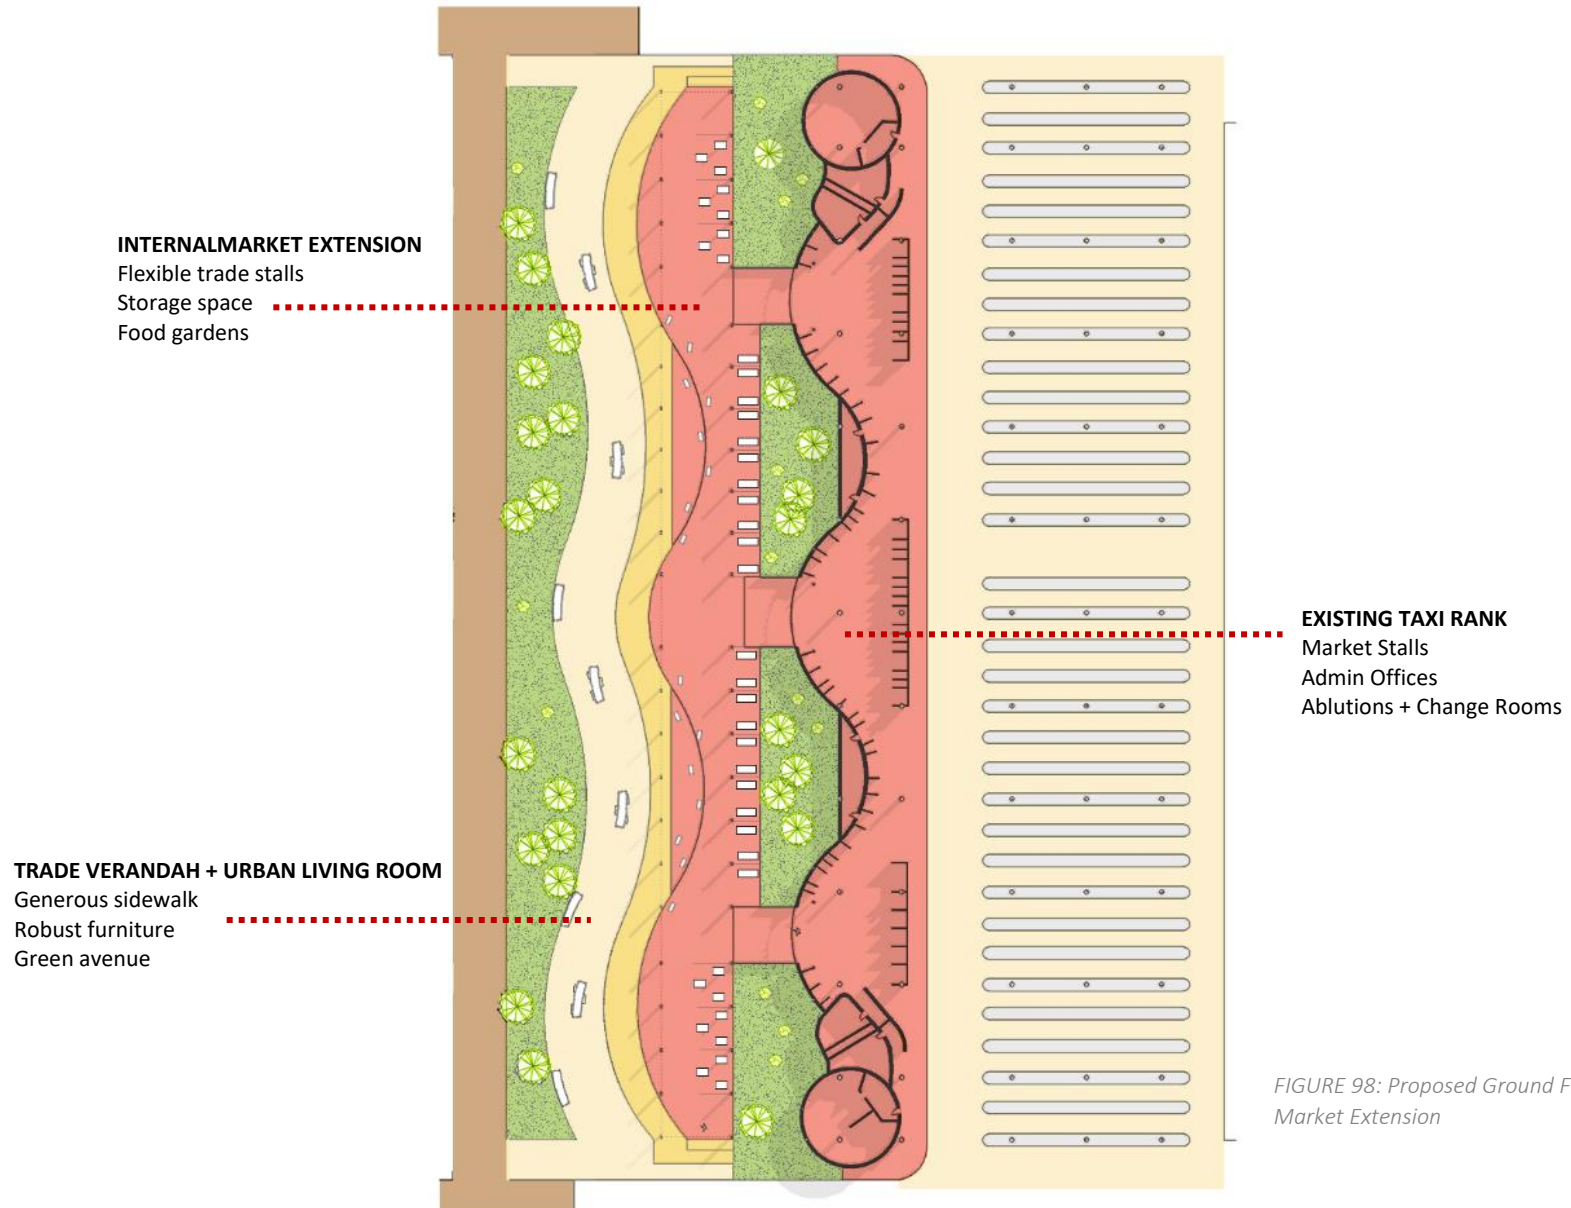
Proposed Ground Floor Plan of Taxi Rank and Market Extension
